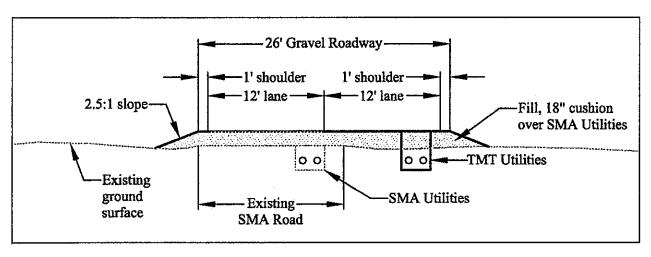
General Cross Section of Access Way in Lava Flow Section Overlapping SMA Road
